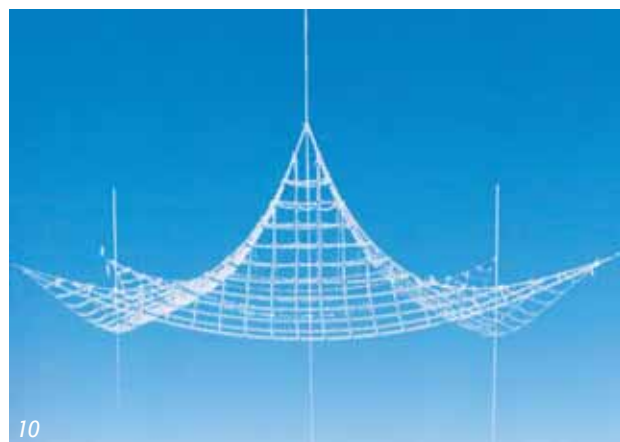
Revolving symmetrical structures – rectangular arrangement of the cables and precast members
